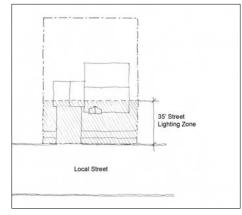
Lighting zone for placement of required residential lighting. This lighting provides local street illumination.
